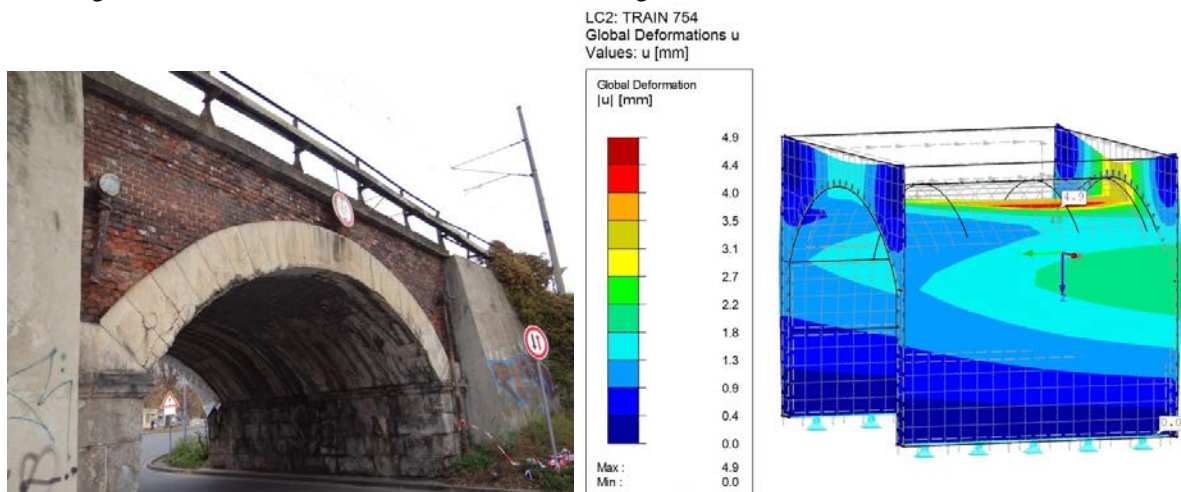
(a) Brick railway arch damaged by longitudinal cracks; (b) Deformation of shell model from a movable load.
